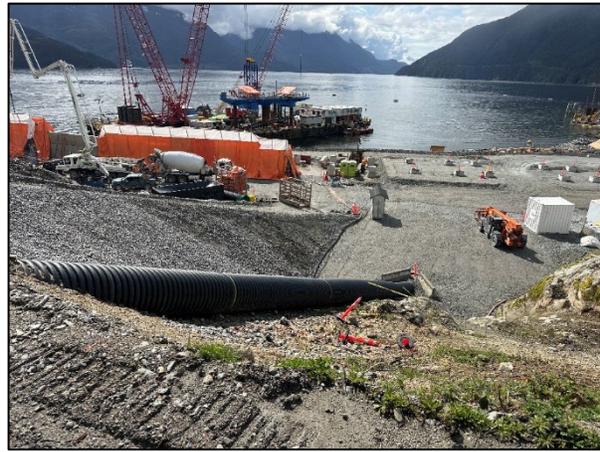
Standing on the gravel access road looking south along at the culvert that discharges East Creek into Howe Sound on April 11, 2025.
